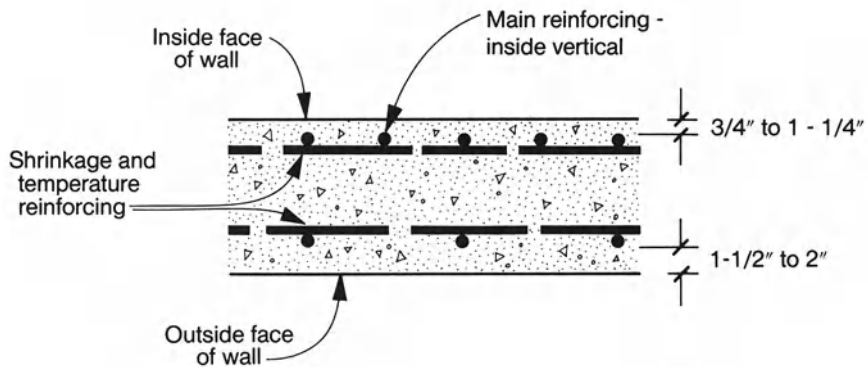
Typical wall reinforcing, for vertical design.
